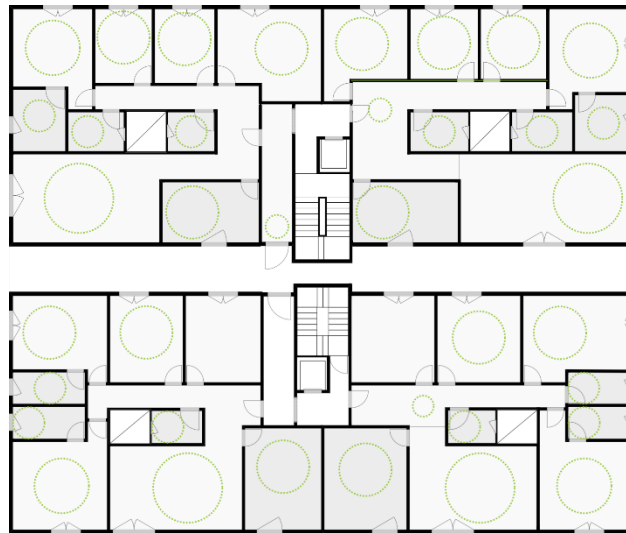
Hybrid AI-manual plan by ArchiteChtures.
